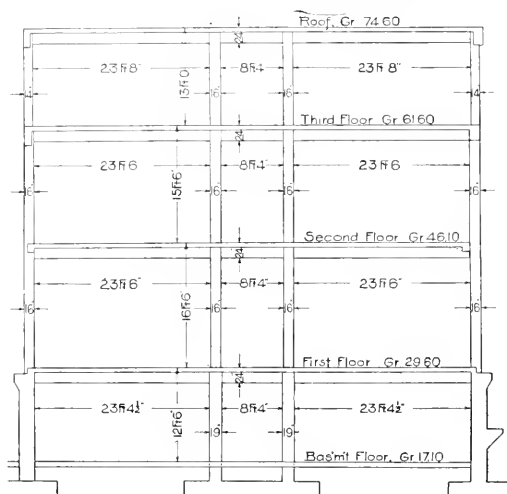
CROSS SECTION OF BUILDING ON MINOR COURT.
